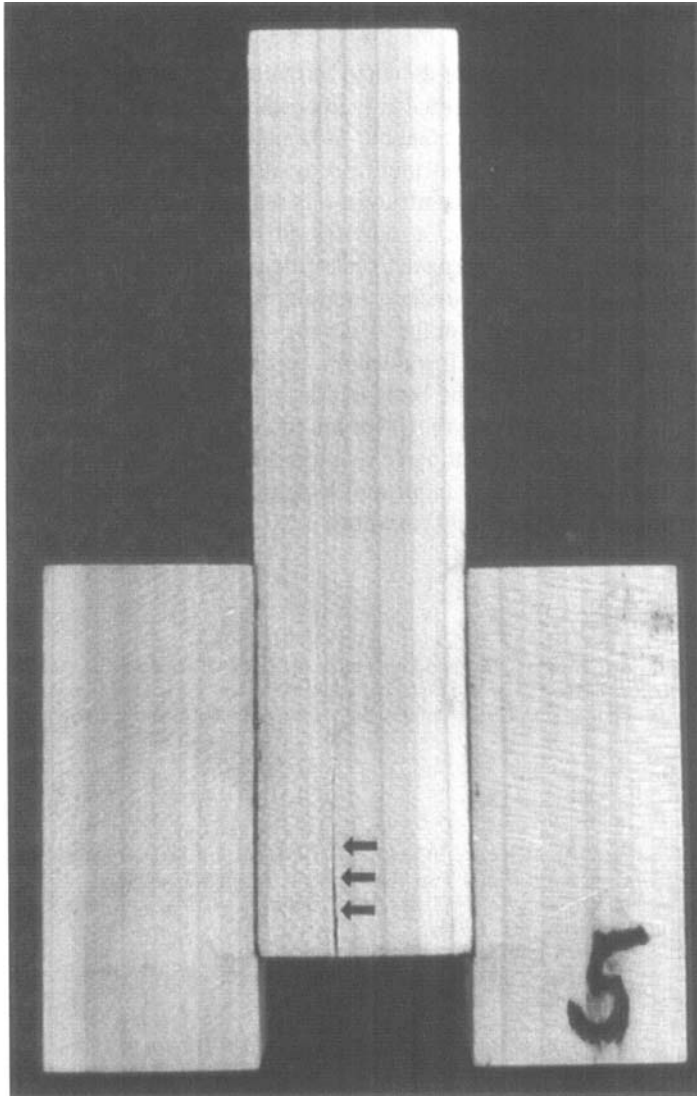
Photograph of the Failed 38.1 mm Overlap Specimen #5.
